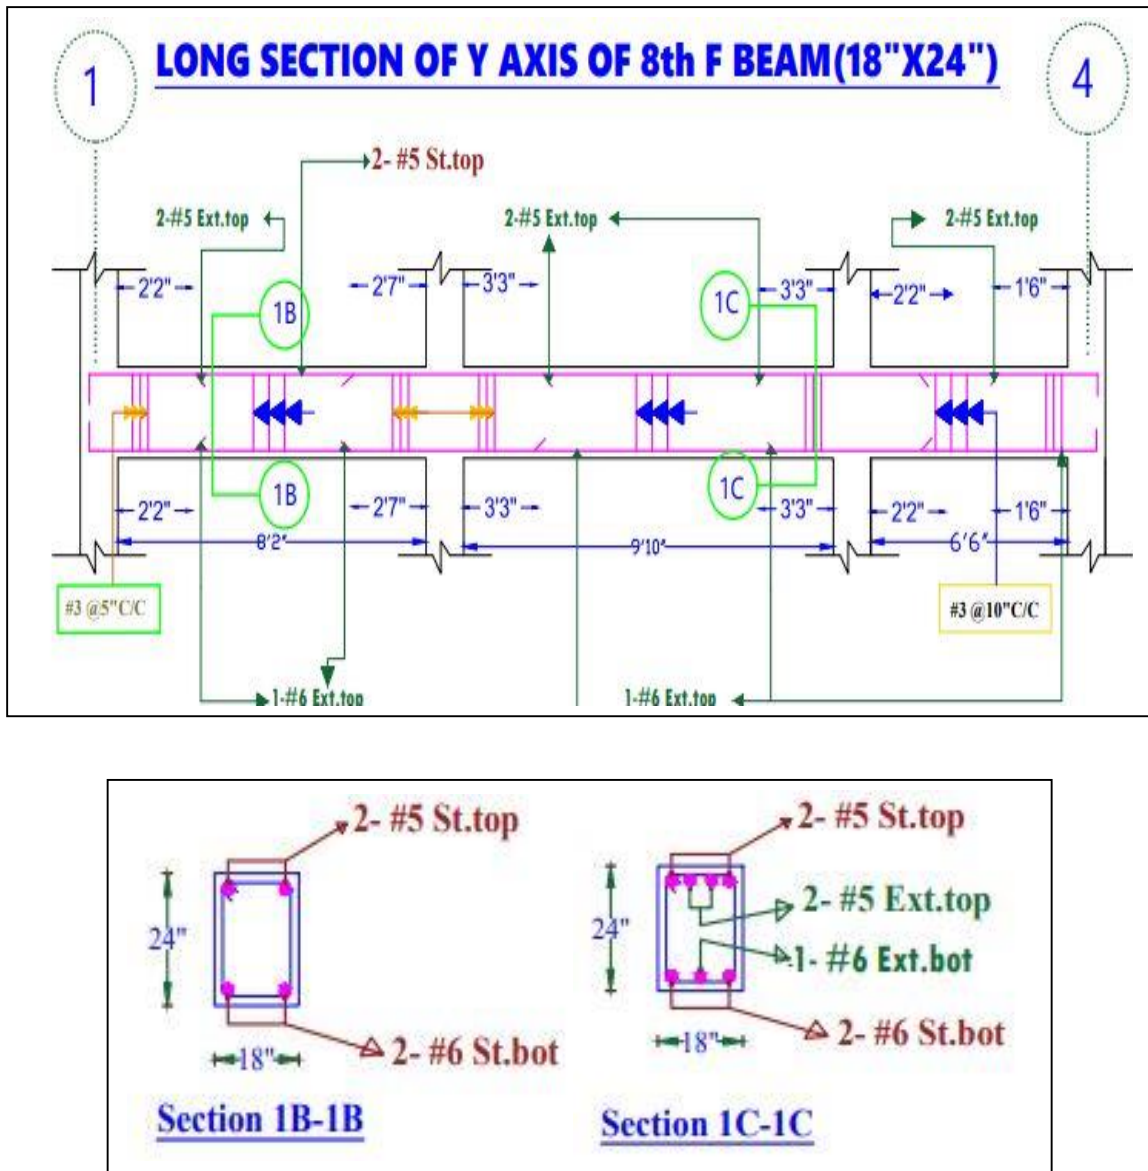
Beam Detailing & Cross Section of Y-axis
